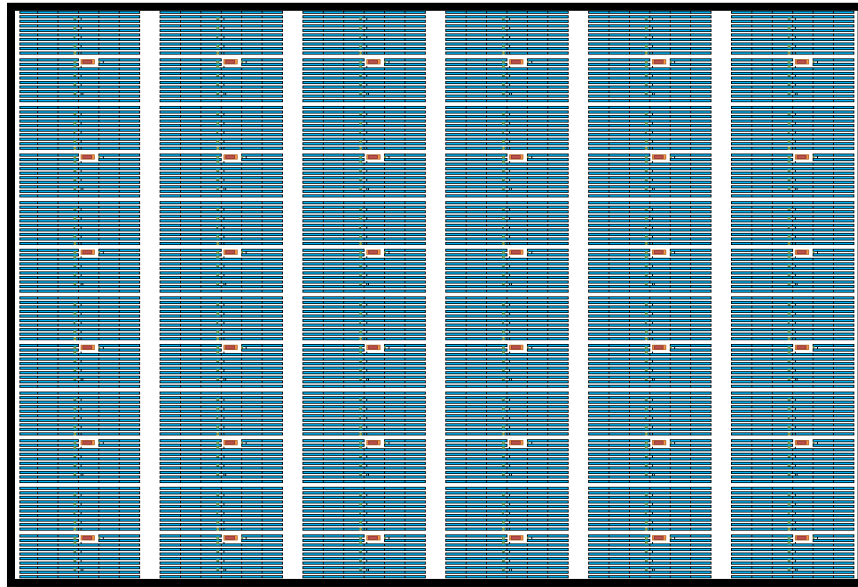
6X6 Solar Plant Arrangement Layout
